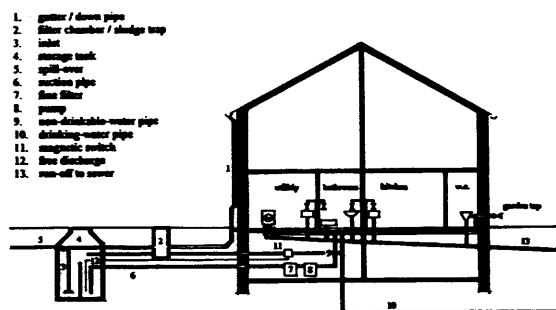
Rain water storage outside the building (Kennedy, 1997)
